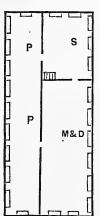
is a plan of the floor above. The entrance from the street is at E. The
